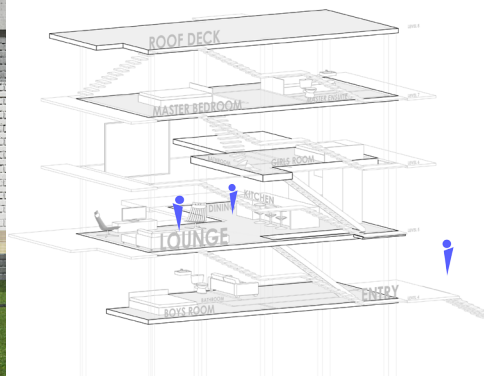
| Open plan kitchen linking dining and living spaces.
